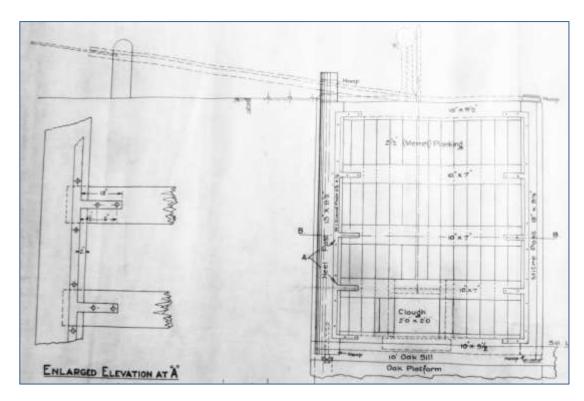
Details of the proposed1928 renewal work to East Cottingwith Lock gates (CRT archives, Leeds, ref: 7518)
